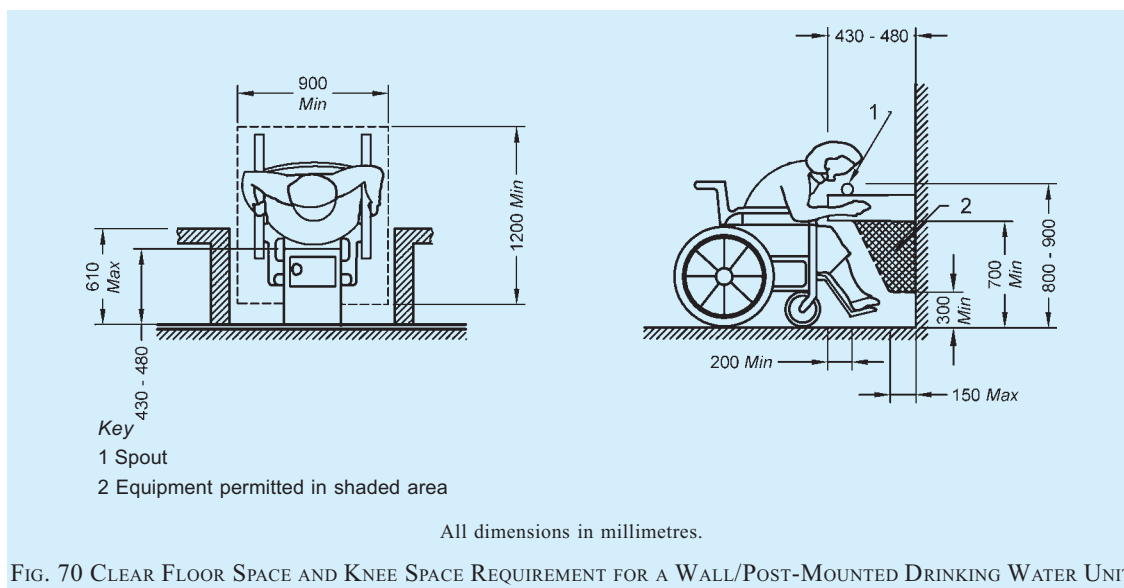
CLEAR FLOOR SPACE AND KNEE SPACE REQUIREMENT FOR A WALL/POST-MOUNTED DRINKING WATER UNIT
